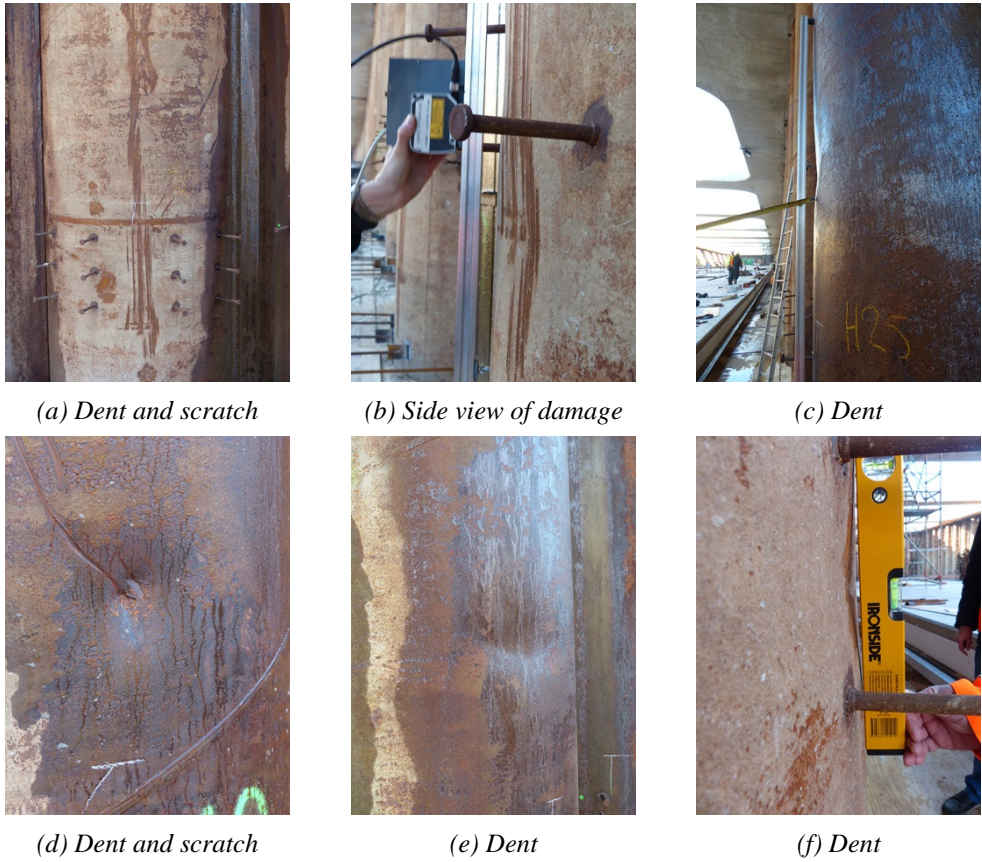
Overview of observed damages in tubes found at construction site.
